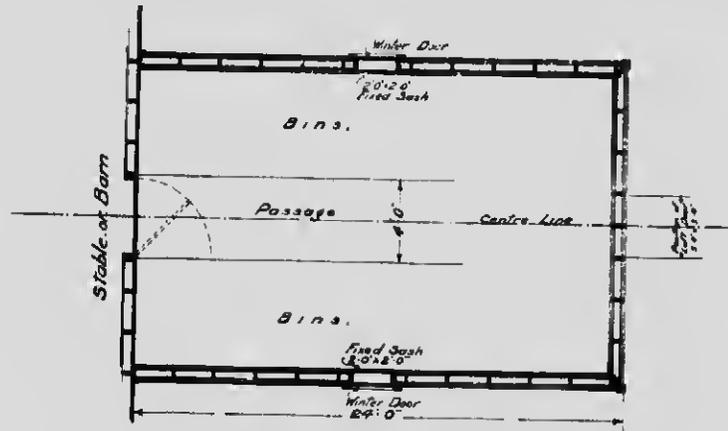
PLAN SHOWING CONSTRUCTION OF FRAME ROOT-HOUSE ABOVE-GROUND.
